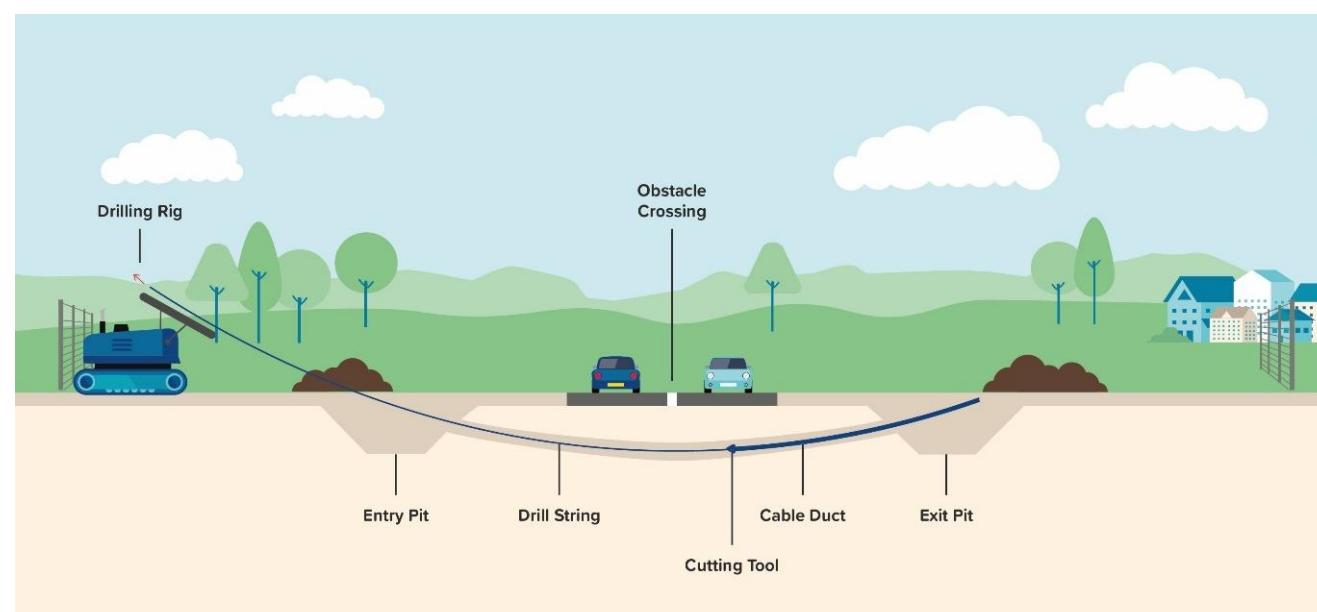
Indicative Cross-Section of Trenchless Duct Installation (Note: Arrangement dependent on the selected trenchless installation technique at each crossing. HDD anticipated to be the most common technique for trenchless obstacle crossings)
